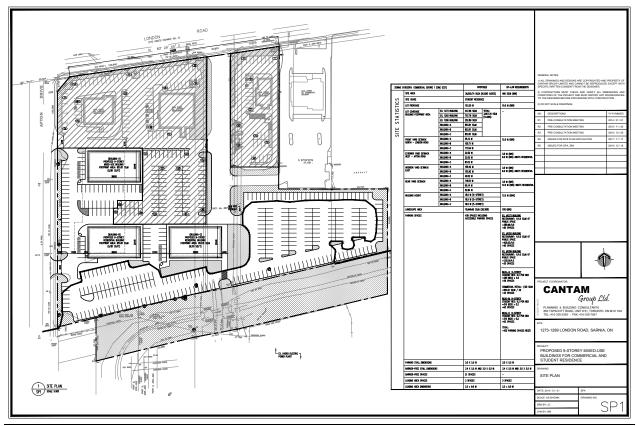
Proposed Site Plan (Credit to Cantam Group Ltd.)
